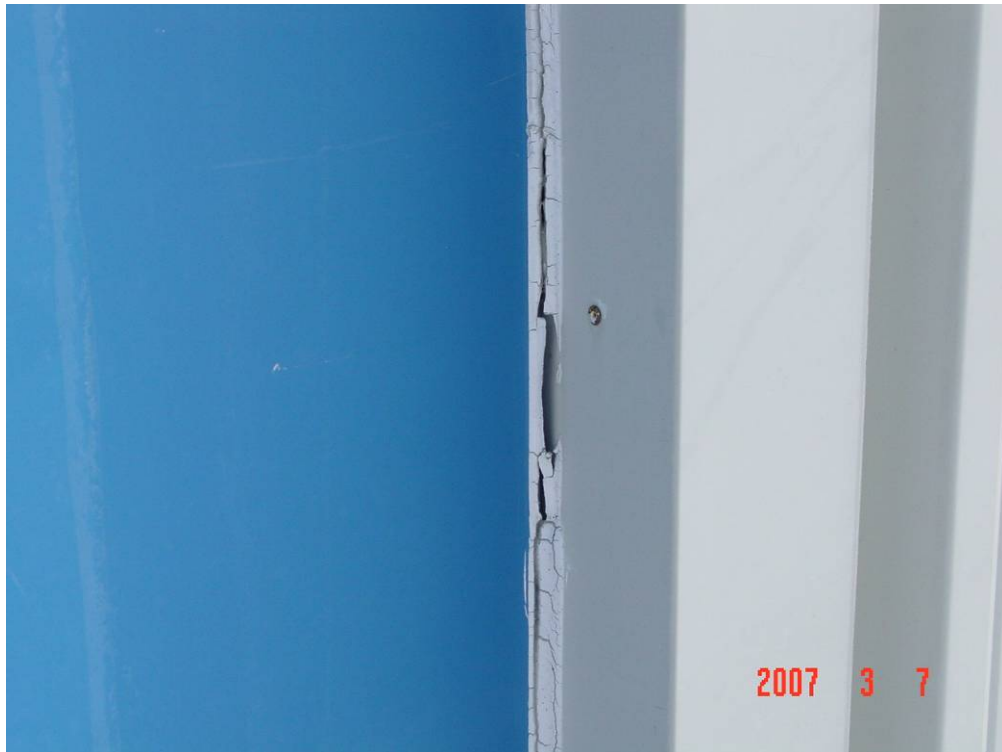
Sealant deterioration at the control joints at the full height of the concrete block walls.
